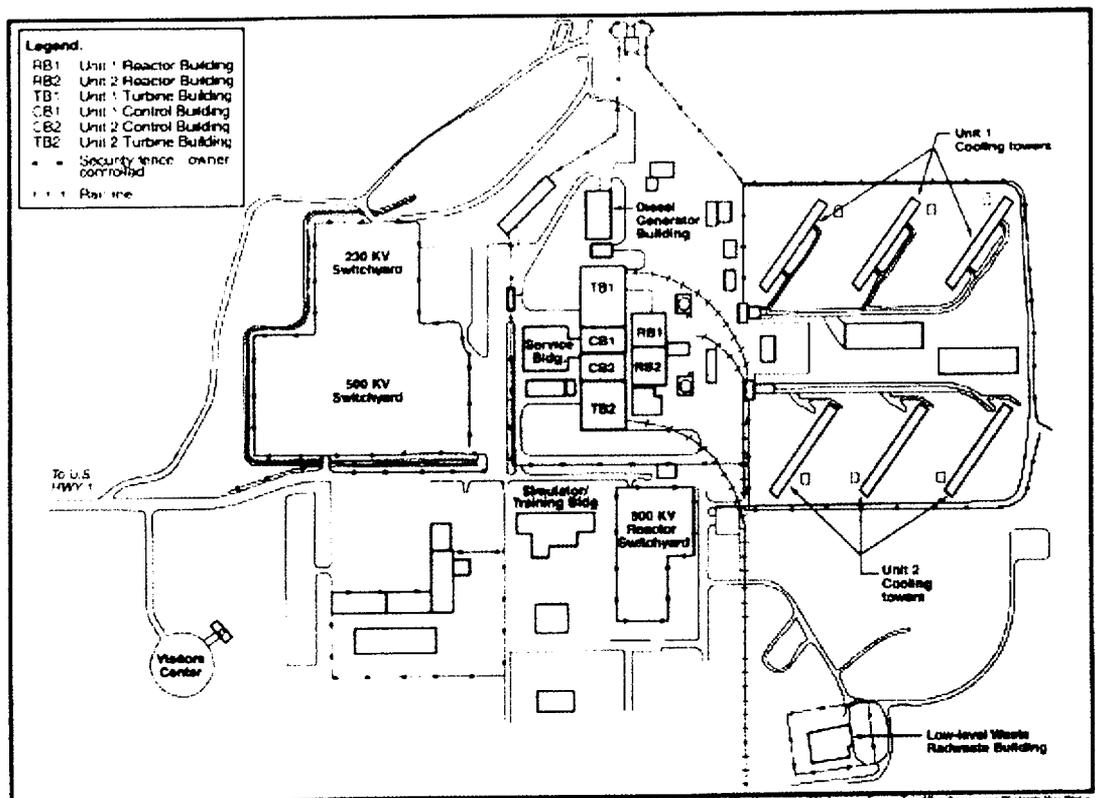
HNP Edwin I. Hatch Nuclear Plant site plan
